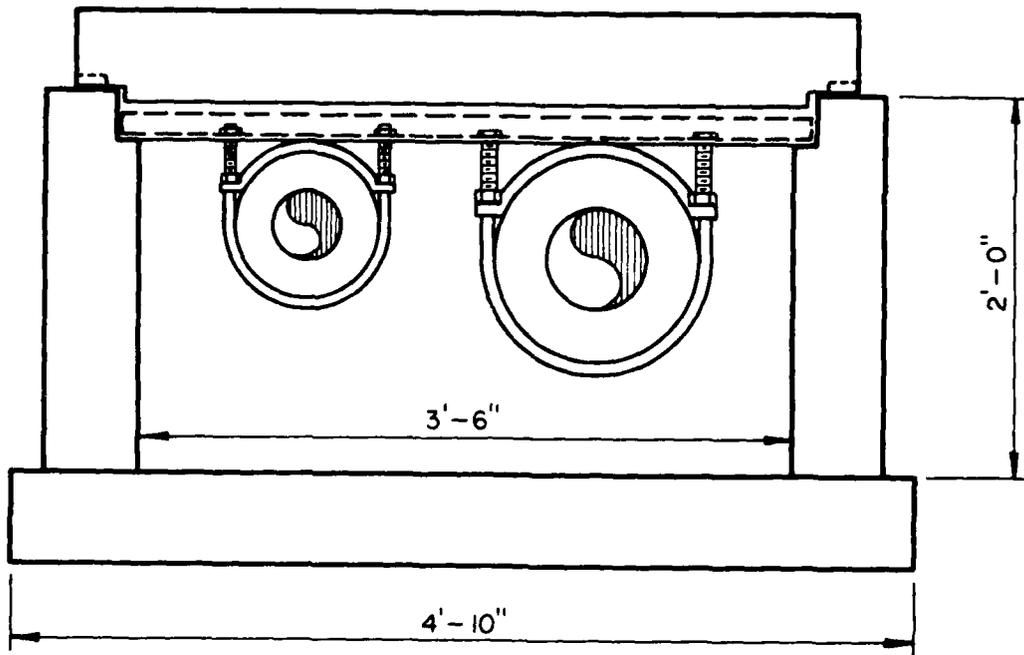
The shallow concrete surface trench (S-U) system, pipes supported by U-bolts.
